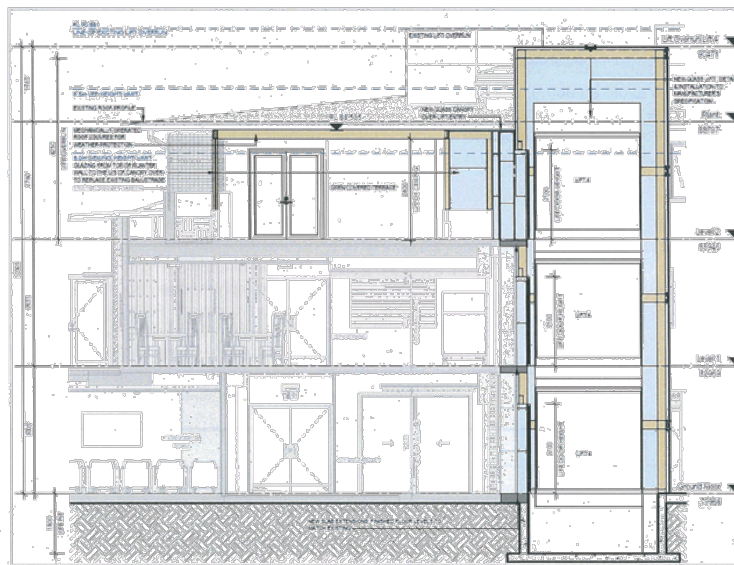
Extract from Glass Lift Detail: Section 2 (Source: Team2 Architects)
